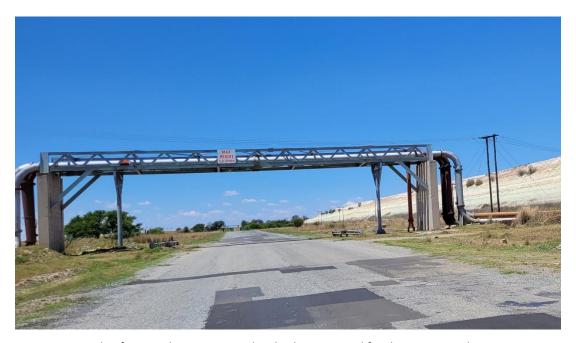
Example of a typical Harmony pipeline bridge proposed for the project at the water crossing
